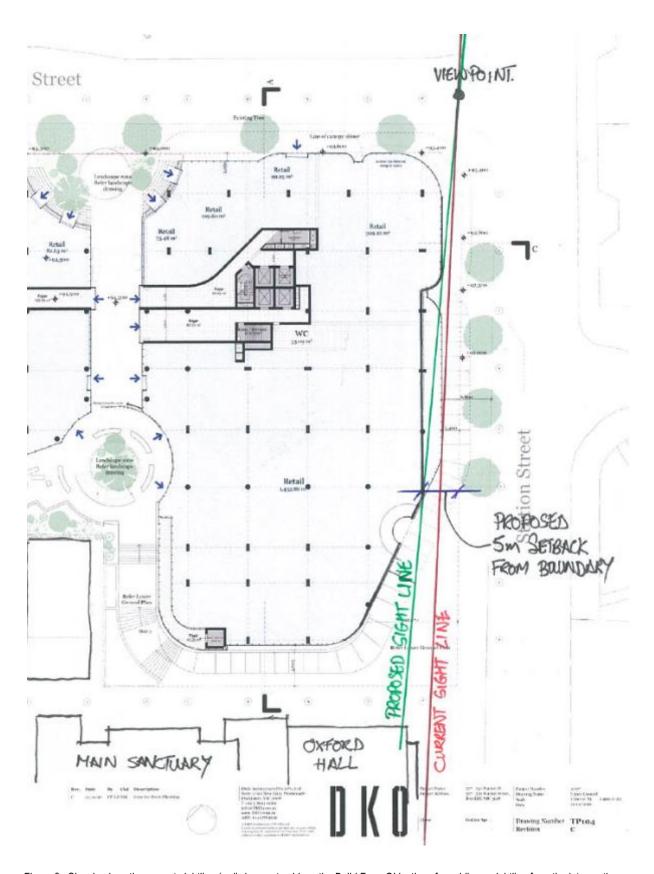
Showing how the current sightline (red) does not achieve the Build Form Objective of providing a sightline from the intersection to the façade of Oxford Hall. To enable this objective to be achieved it is proposed the façade be setback 5m from the property boundary. It is interesting to note that the subject site was not indicated on the plans at this level, which is suggestive of how much regard has been given to the Heritage Place. Source: Trethowan mark-up of DKO drawing TP104 rev C.
